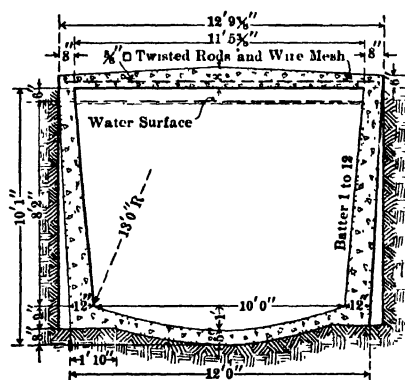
Covered Concrete Conduit in Excavation, Los Angeles Aqueduct.
